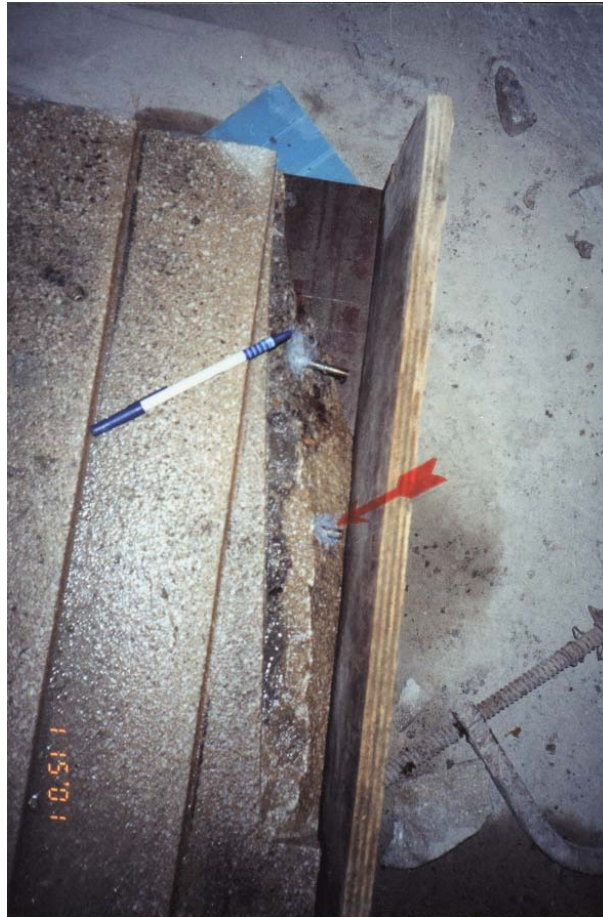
Cracked Stone (cracked portion removed). New stainless steel dowels installed to ‘stitch’ the cracked portion back to the stone with epoxy adhesive.
